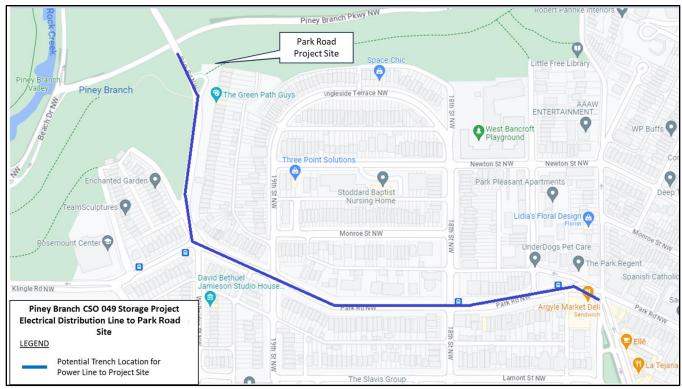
Potential Trench Location for Electrical Distribution to Park Road CSA
